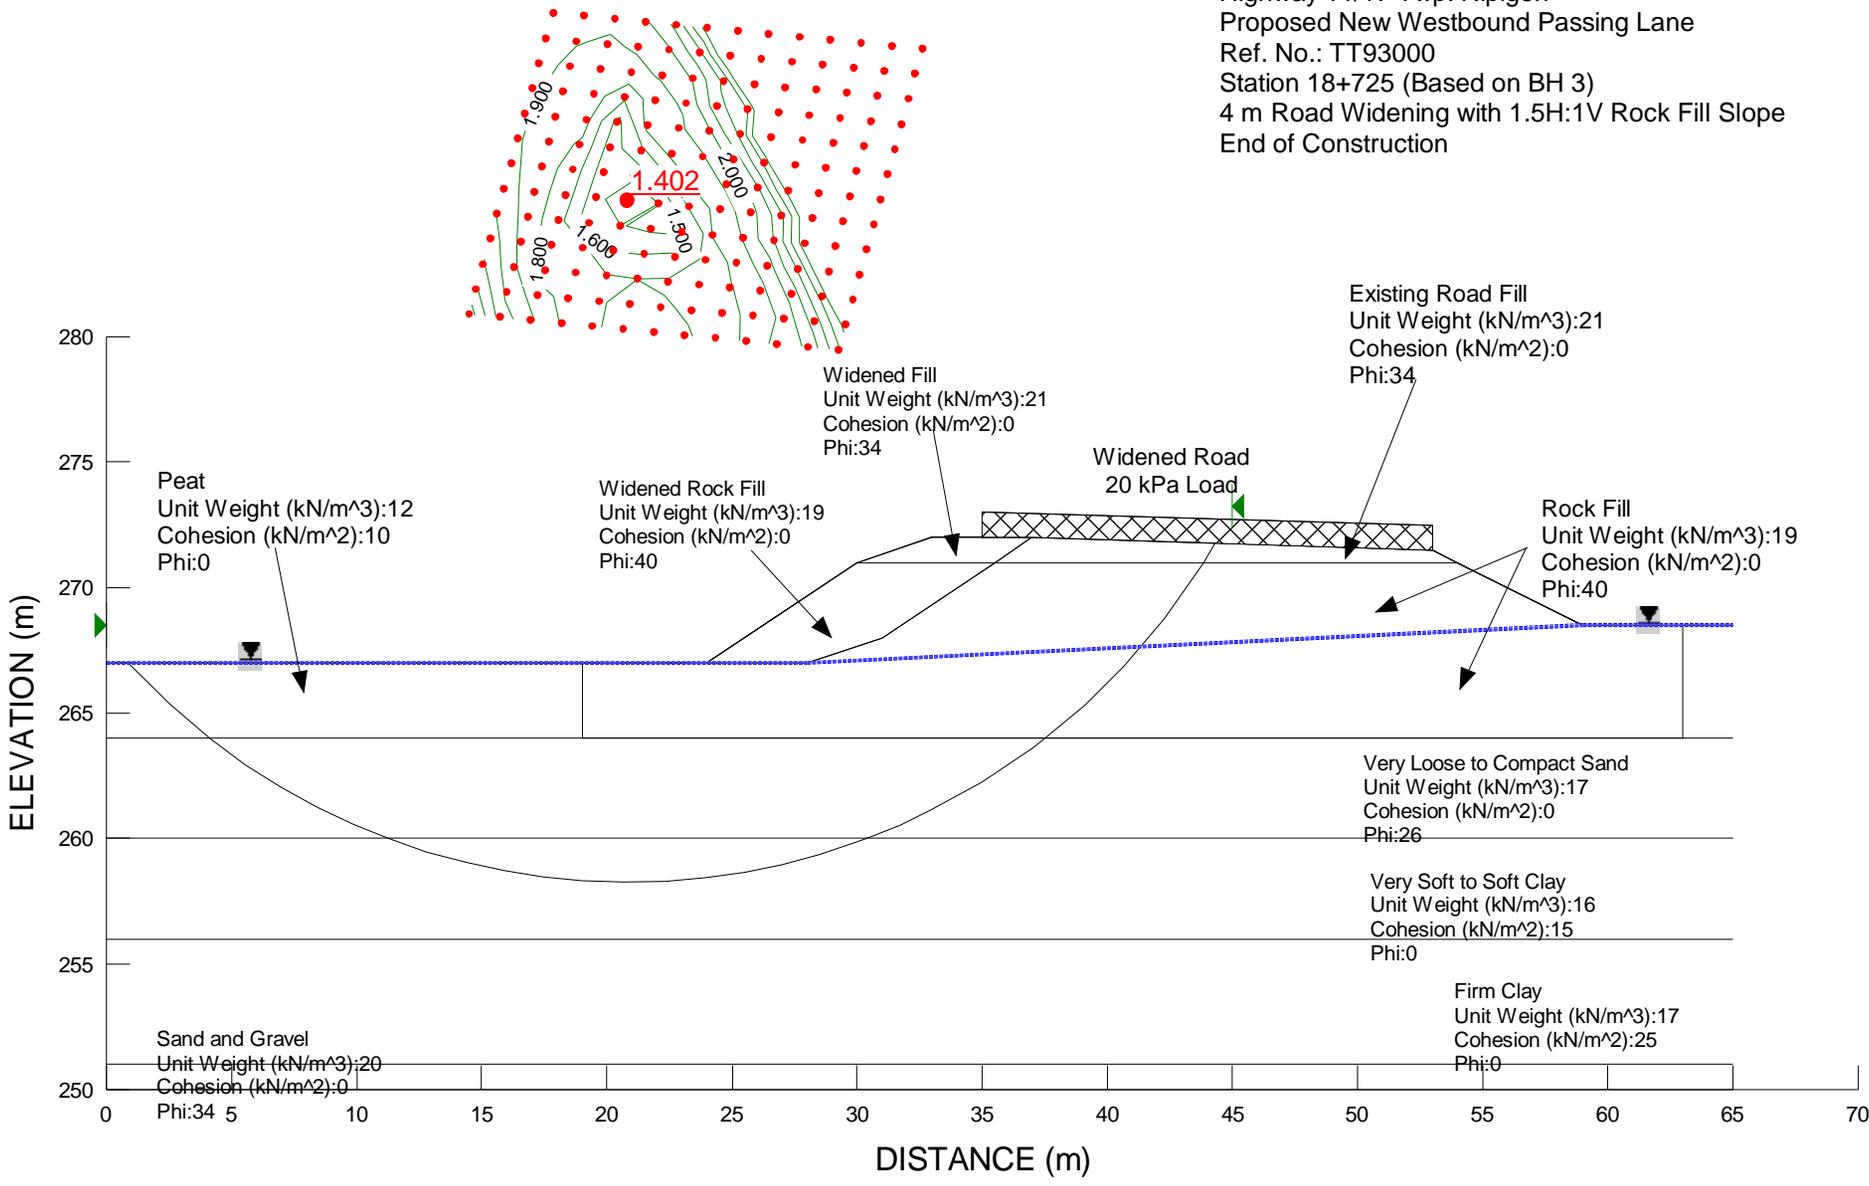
Slope Stability Analysis of Section at Station 18+725 with 4 m Road Widening (End of Construction - Slip Surface within Westbound Lane)
